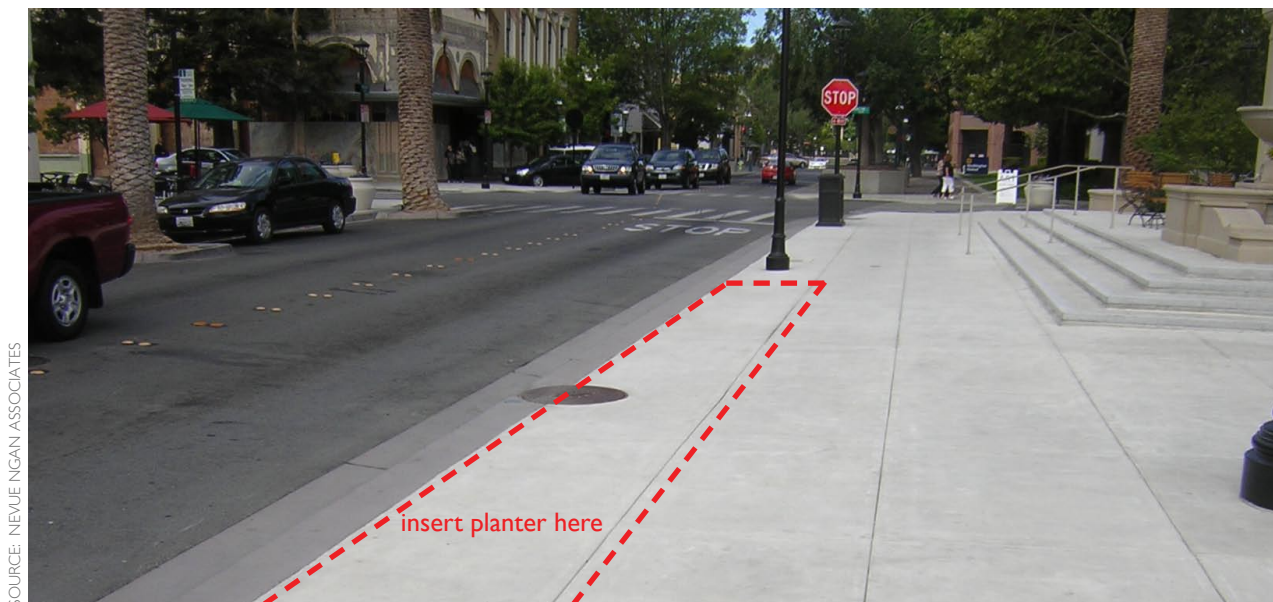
This urban street in San Mateo County has no on-street parking and a very wide sidewalk space. This is a perfect opportunity for inserting a stormwater planter. Dashed lines show where a planter could be added.
